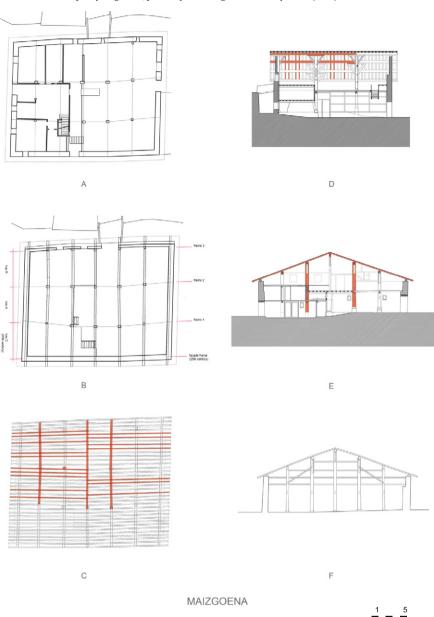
Maiz Goena farmhouse: a) ground floor, b) first floor, c) roof structure, d) longitudinal section, e) cross section, f) façade's frame. Bays and frames marked in pink at draw b). Dendrochronological samples marked in red at draws c), d) and e).
